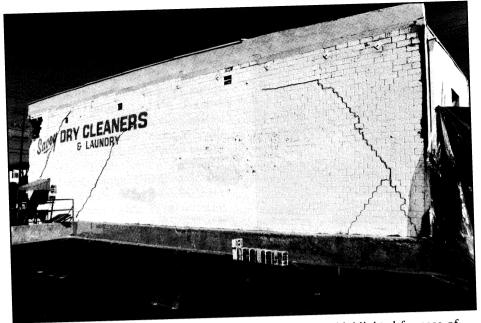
Failure of URM wall-Major cracks have been highlighted for ease of identification (Photo courtesy of External Reinforcement, Inc.)
